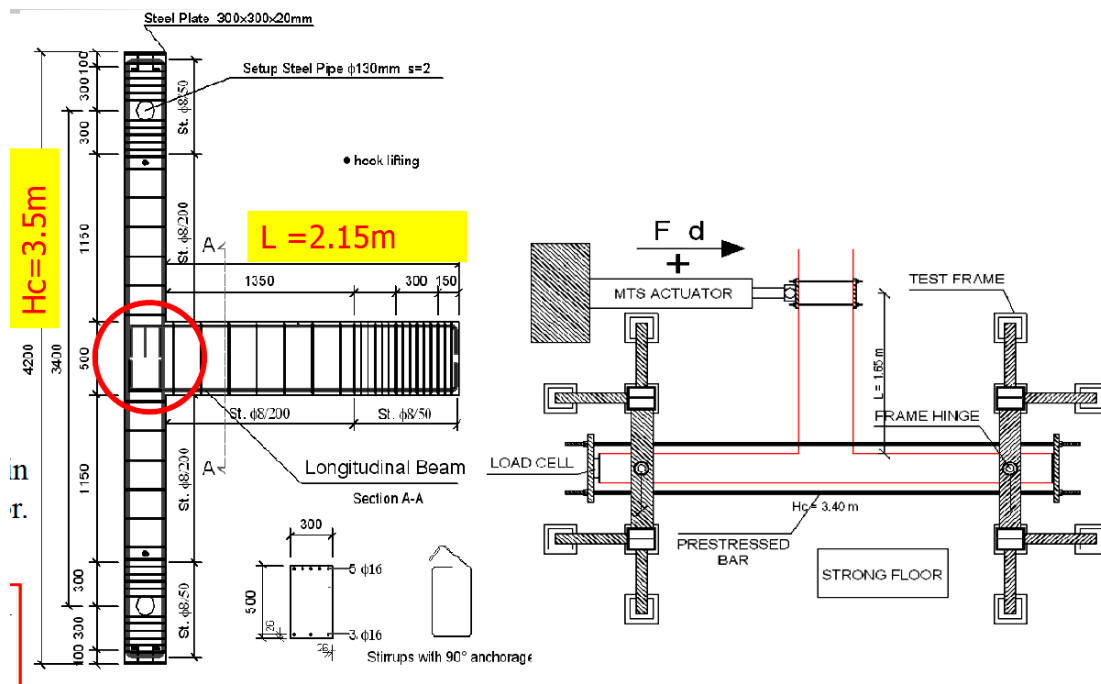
Reinforcement detail for all specimen and test setup used in experimental program
